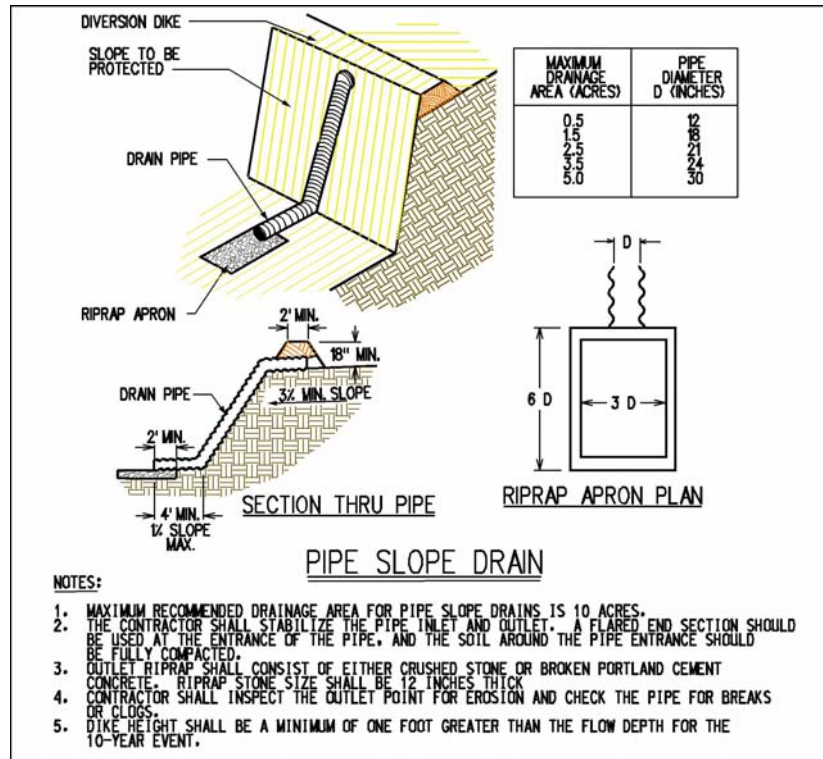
An illustration of a pipe slope drain stormwater control structure.
